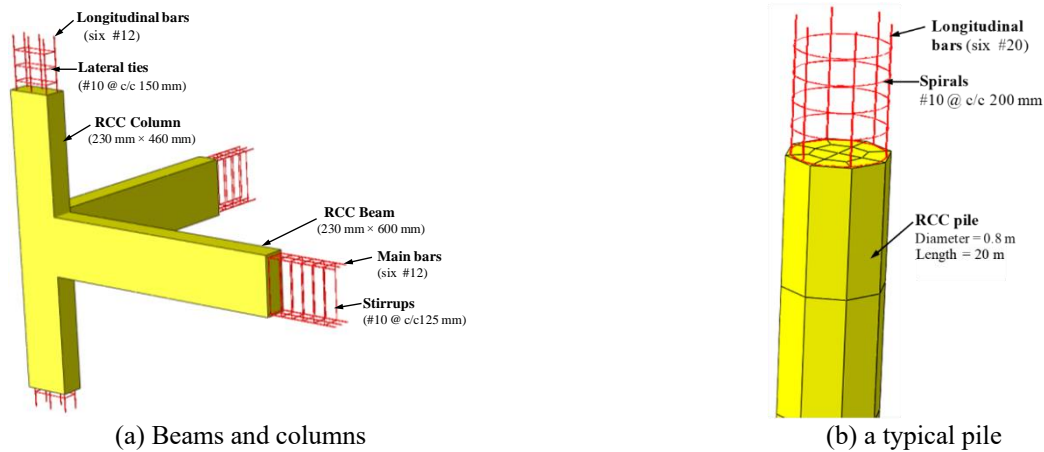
Sections and reinforcement details of (a) beams and columns and (b) a typical pile
